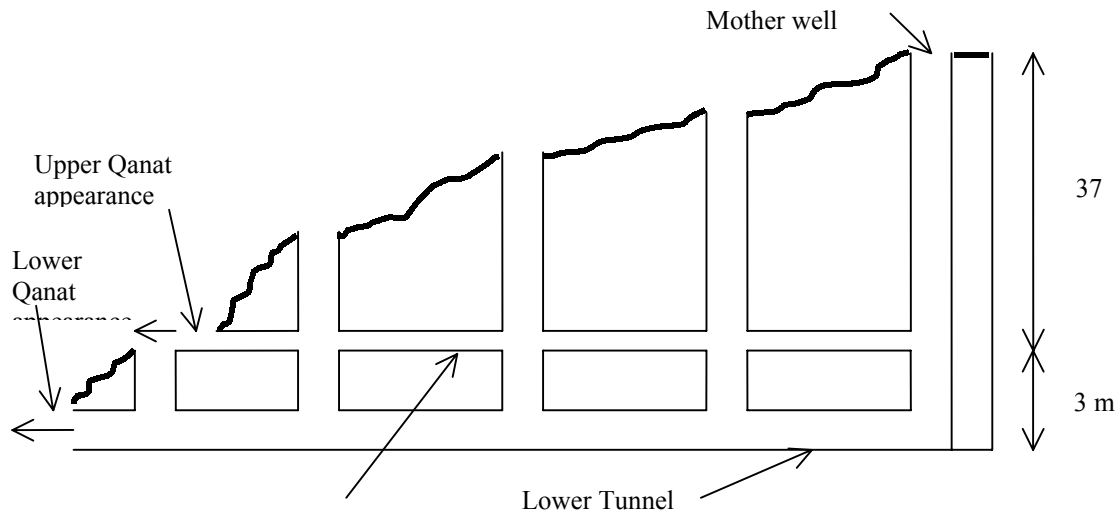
Longitudinal section of Moon Qanat in Ardestan, Isfahan Province
